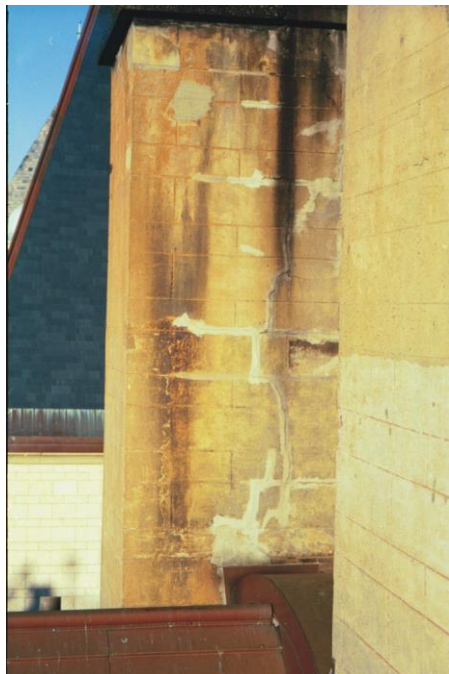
Masonry failure due to repointing with hard mortar.
